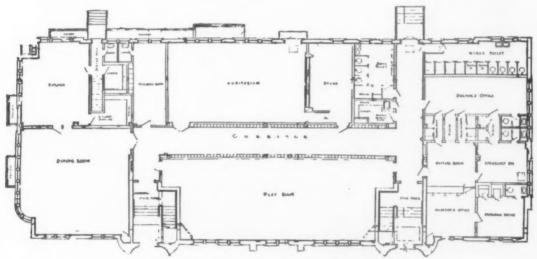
A. FIRST FLOOR PLAN, NEWARK OPEN-AIR SCHOOL
